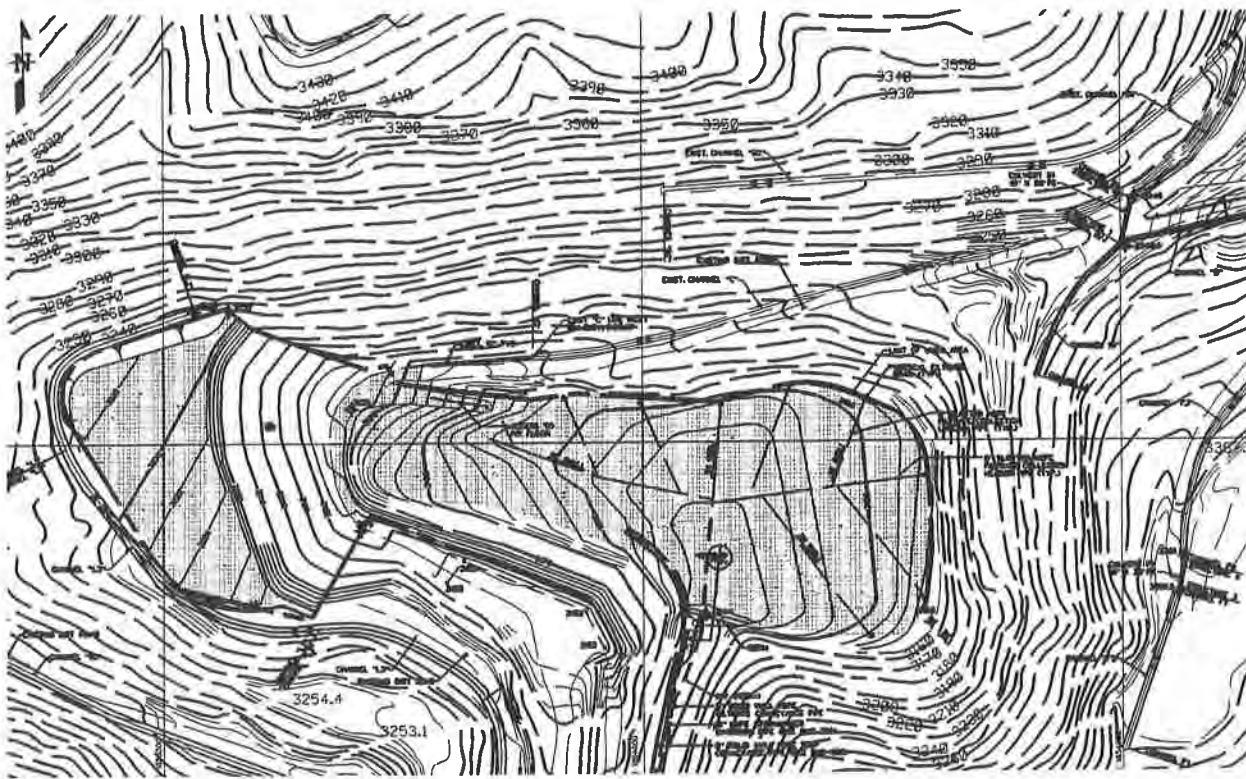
Grading Plan for the Brick Flat Pit Impoundment Facility
